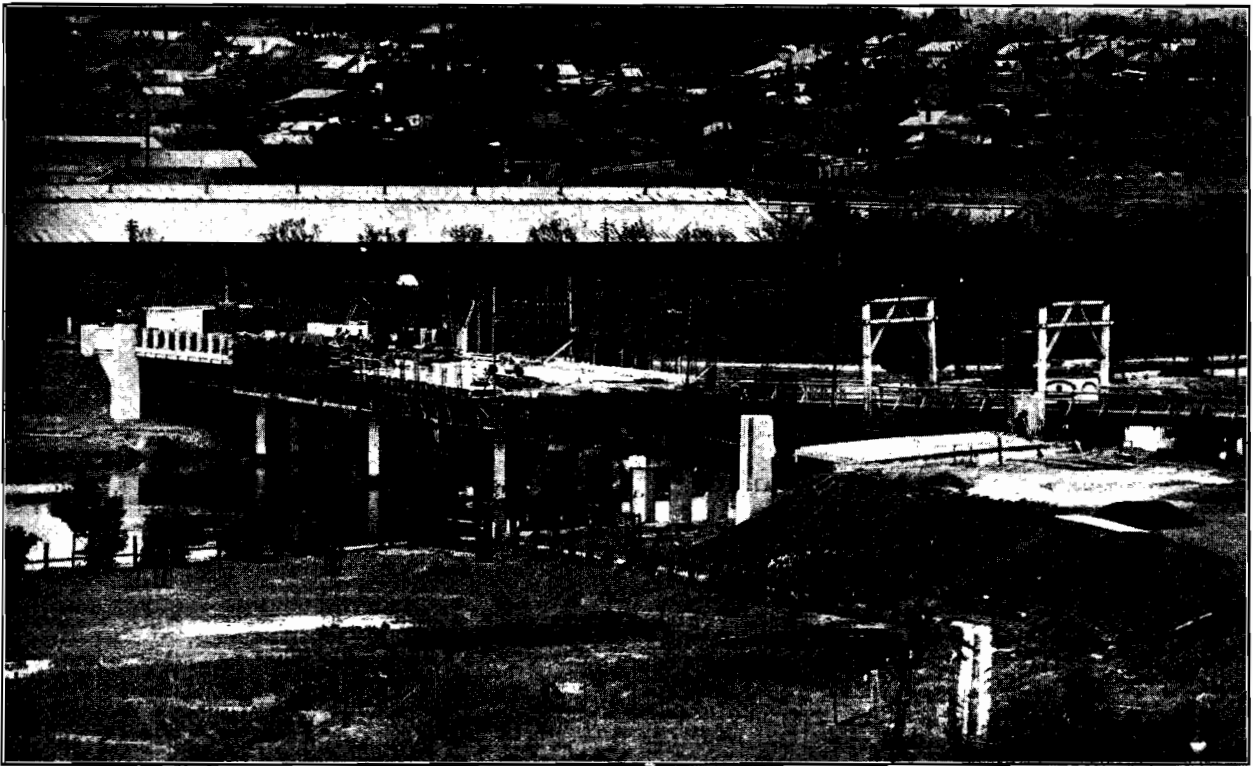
Showing progress made with the construction of Lynch's Bridge over Maribyrnong River.
